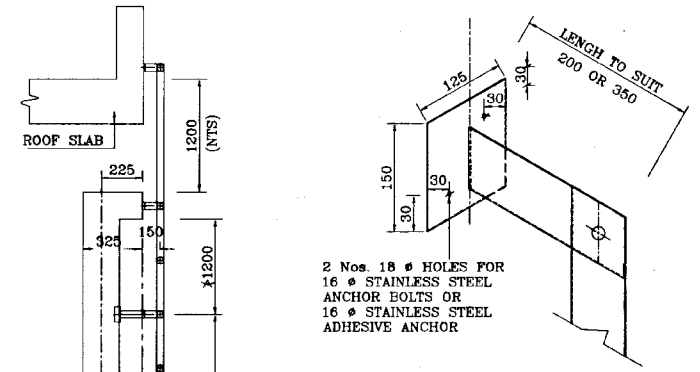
DETAILS OF MANHOLE LANDING PLATFORMS & LADDERS
